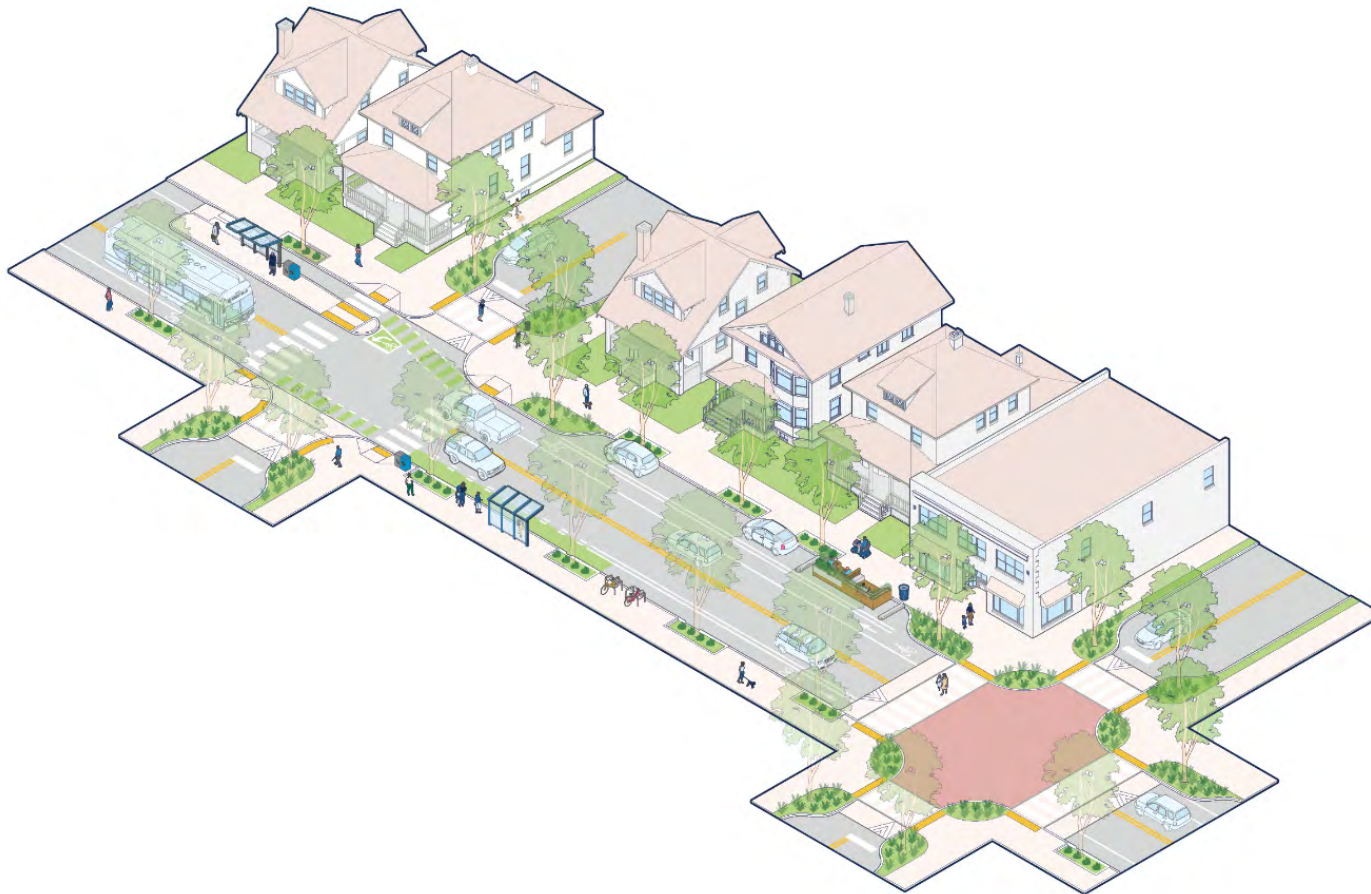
Roadway with Wider Sidewalks and Amenity Zone
